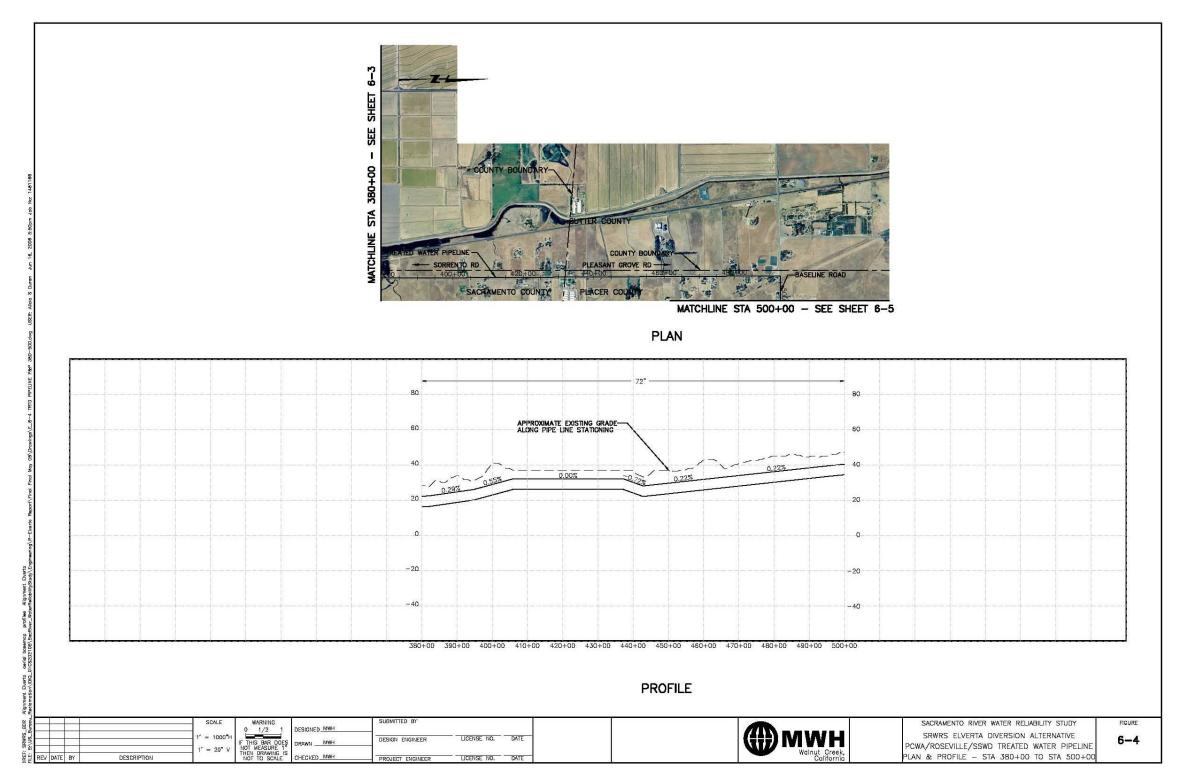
SRWRS Elverta Diversion Alternative Treated Water Pipeline Plan and Profile – STA 380+00 to STA 500+00
